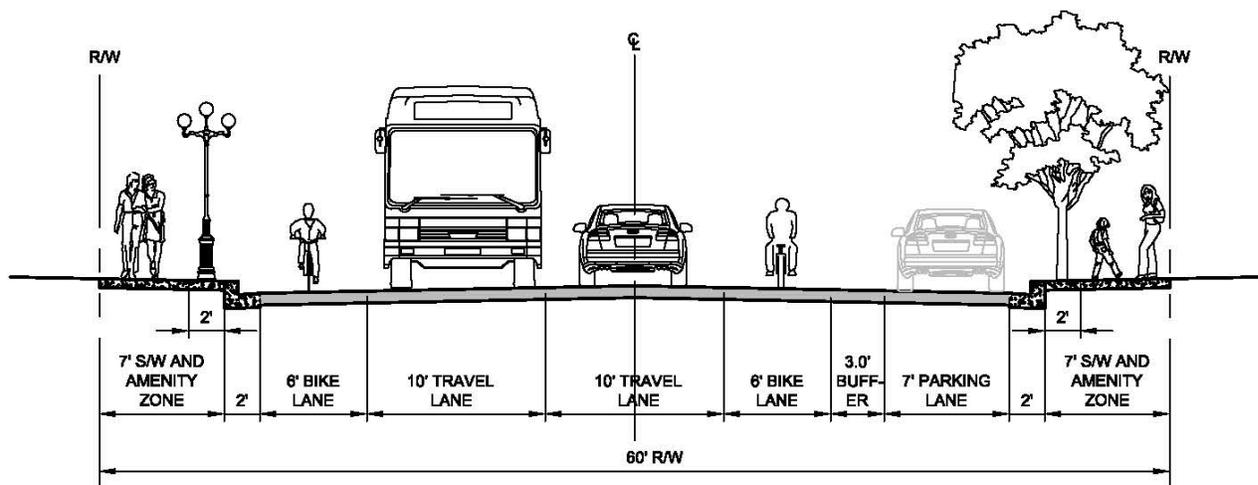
60-Foot Right-of-Way Option C: Partial On-Street Parking with Striped Bicycle Lane
